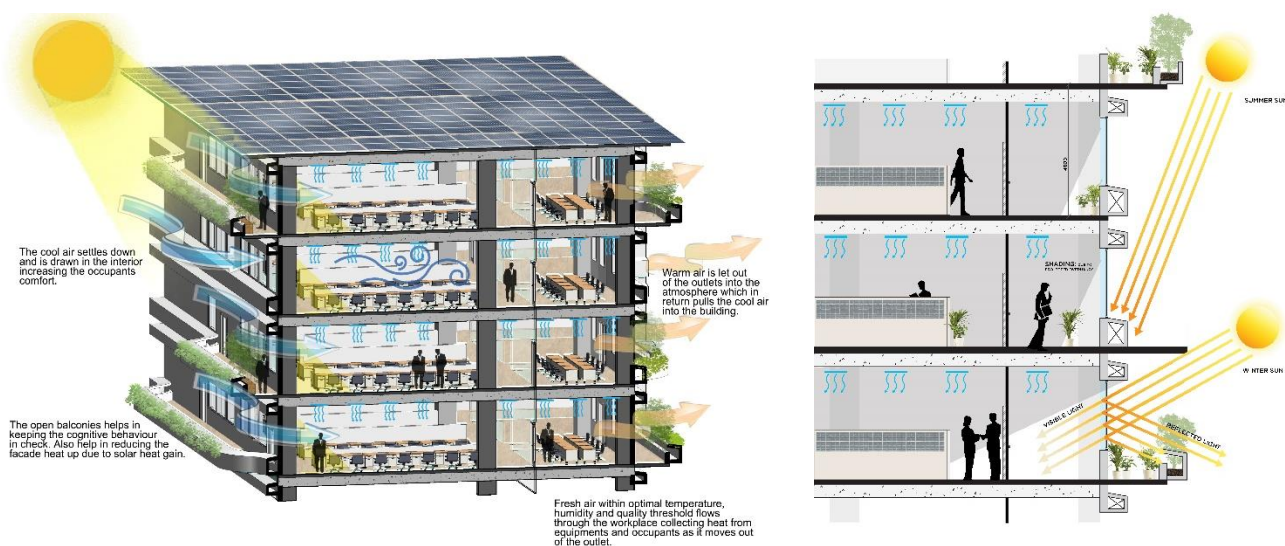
& 8.18 – Building sectional view - Design considerations
